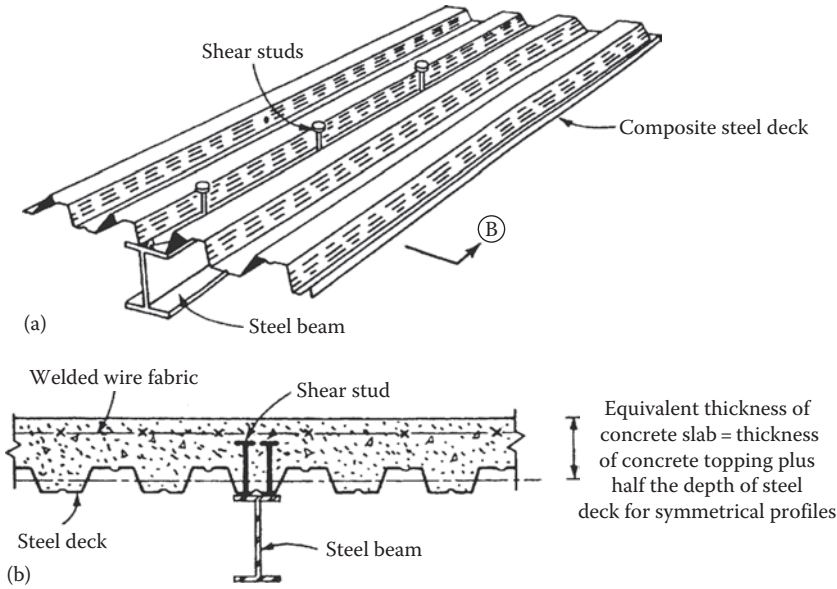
Composite beam with deck ribs parallel to beam: (a) schematic view; (b) section showing equivalent thickness of slab.
